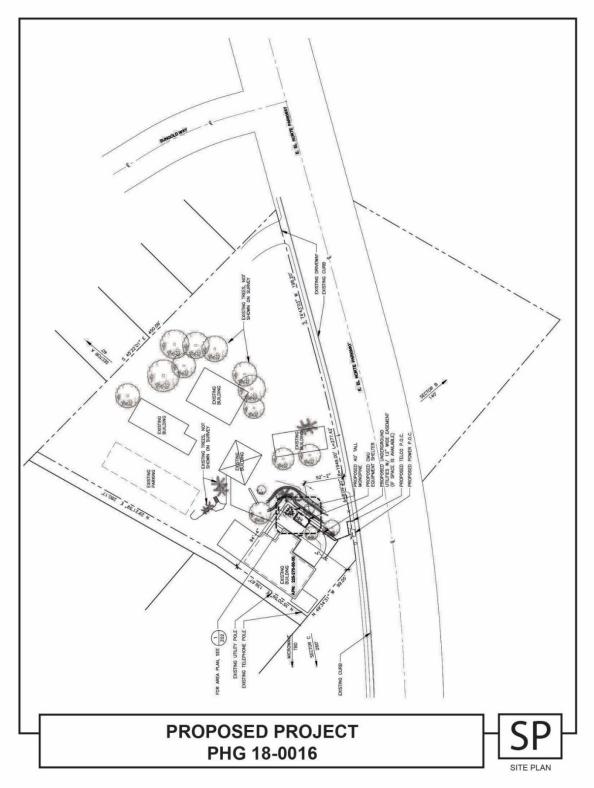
EXHIBIT "B" DEVELOPMENT APPLICATION SITE PLAN PHG18-0016
